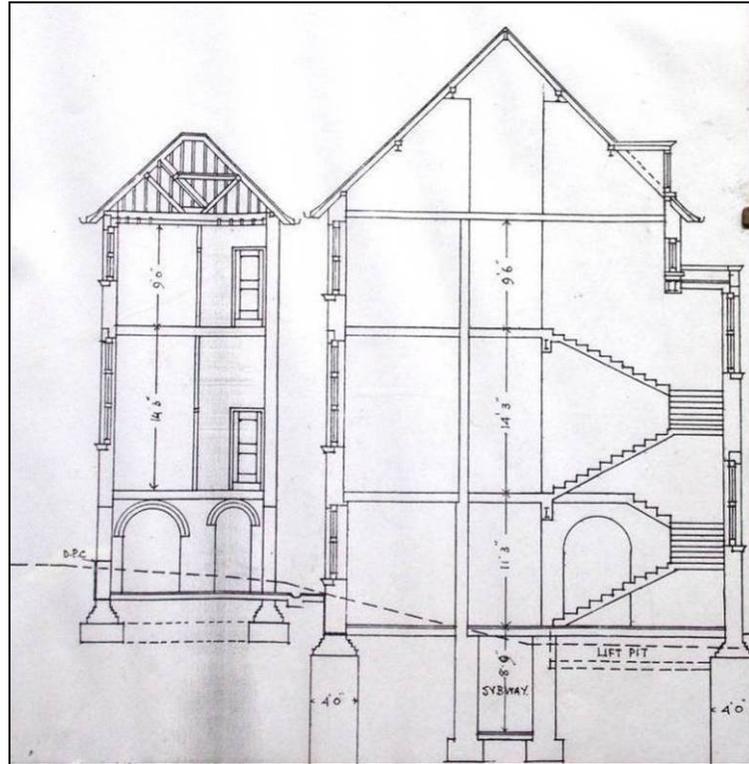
Copy of original architectural drawing of Building 41 showing a cross-section.
